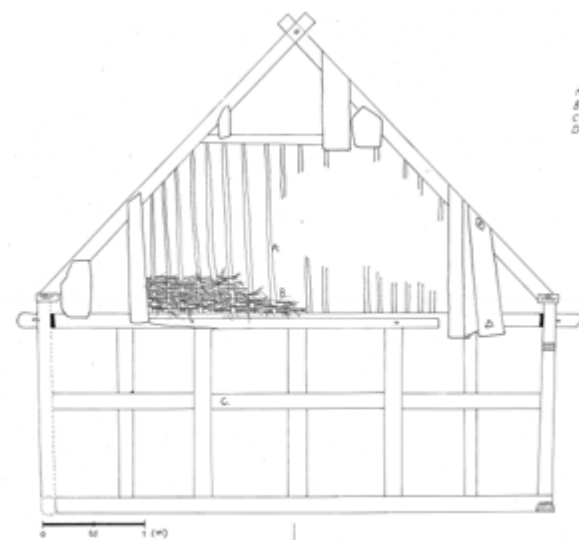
The section shows one of Bondrumsgårdens half-timbered walls and a gable built up with wattle and stakes.© The author
